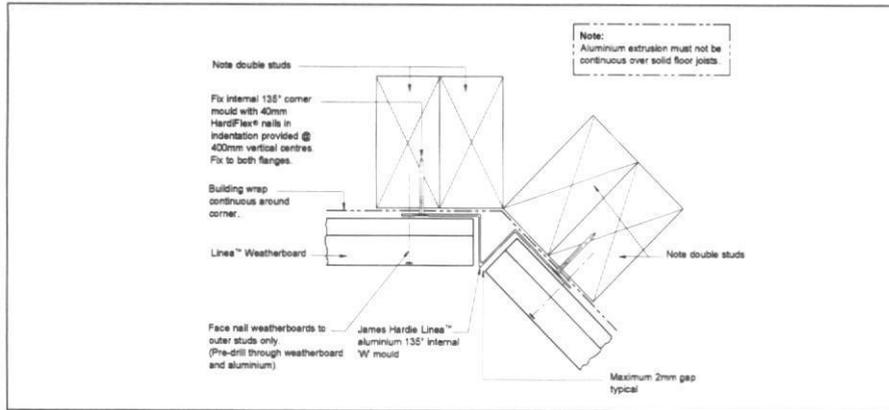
DIRECT FIX INTERNAL 135° ALUMINIUM 'W' MOULD CORNER
